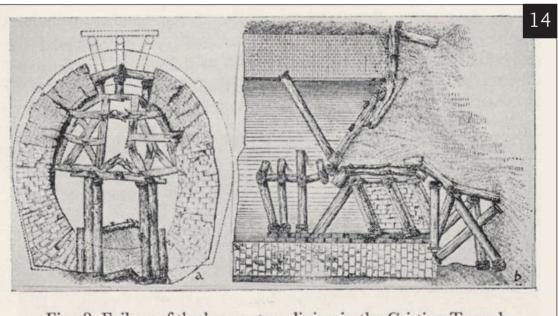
Failure of the heavy stone lining in the Cristina Tunnel owing to the moving ground. To the left is shown the broken lining, to the right a longitudinal section of the collapse.
